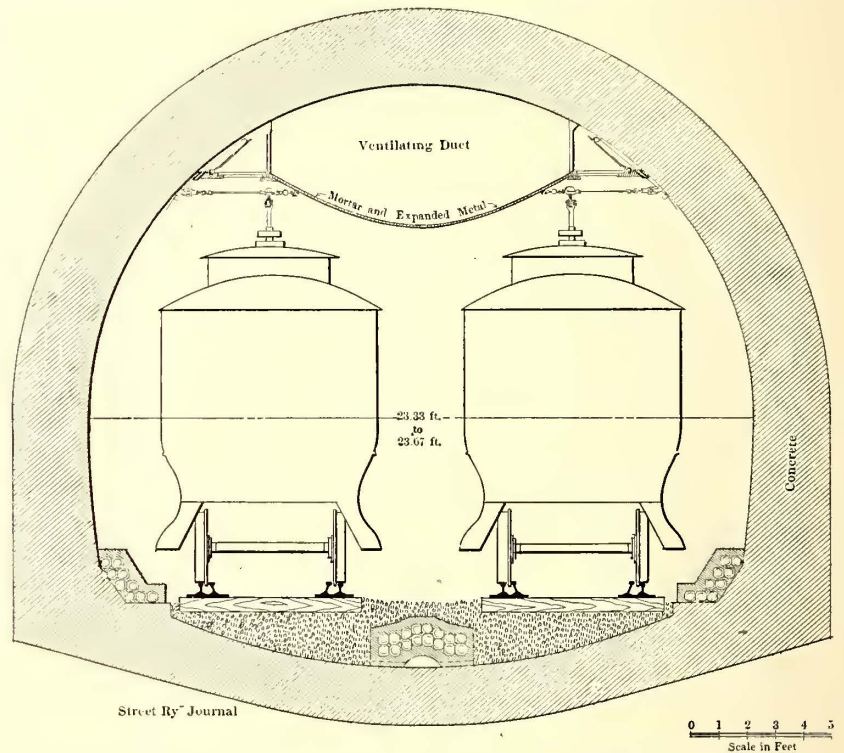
CROSS-SECTION OF EAST BOSTON TUNNEL UNDER THE HARBOR
